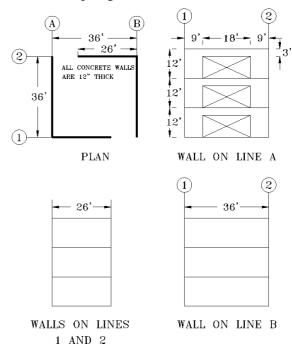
Plan and elevation of a simple three story shear wall building (Note the uniform stiffness along the height of walls on lines A and B.)
